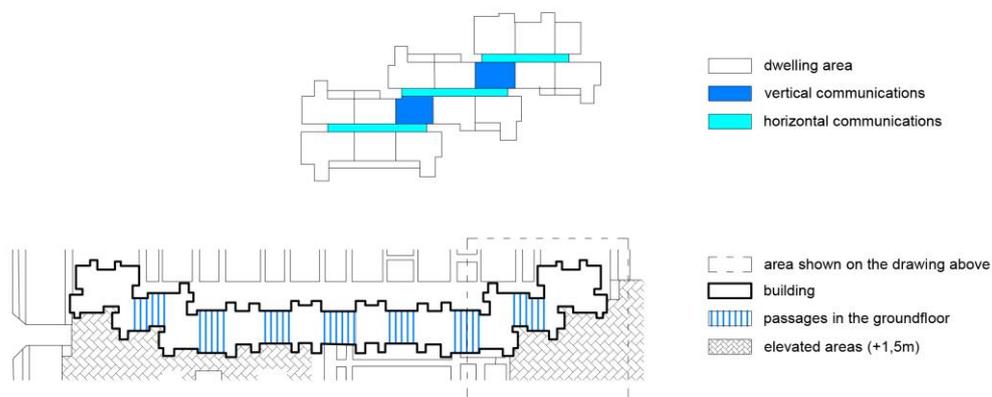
(a) building's typical floor scheme segment, and (b) nearby context surrounding the building in the Block 22; source: Authors
